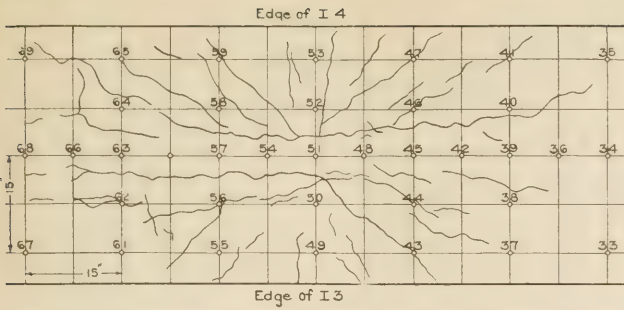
SHOWING CRACKS WHICH BECAME VISIBLE UNDER LOADING POINT UPON APPLICATION OF STATIC LOADS FROM 60,000 TO 75,000 POUNDS
